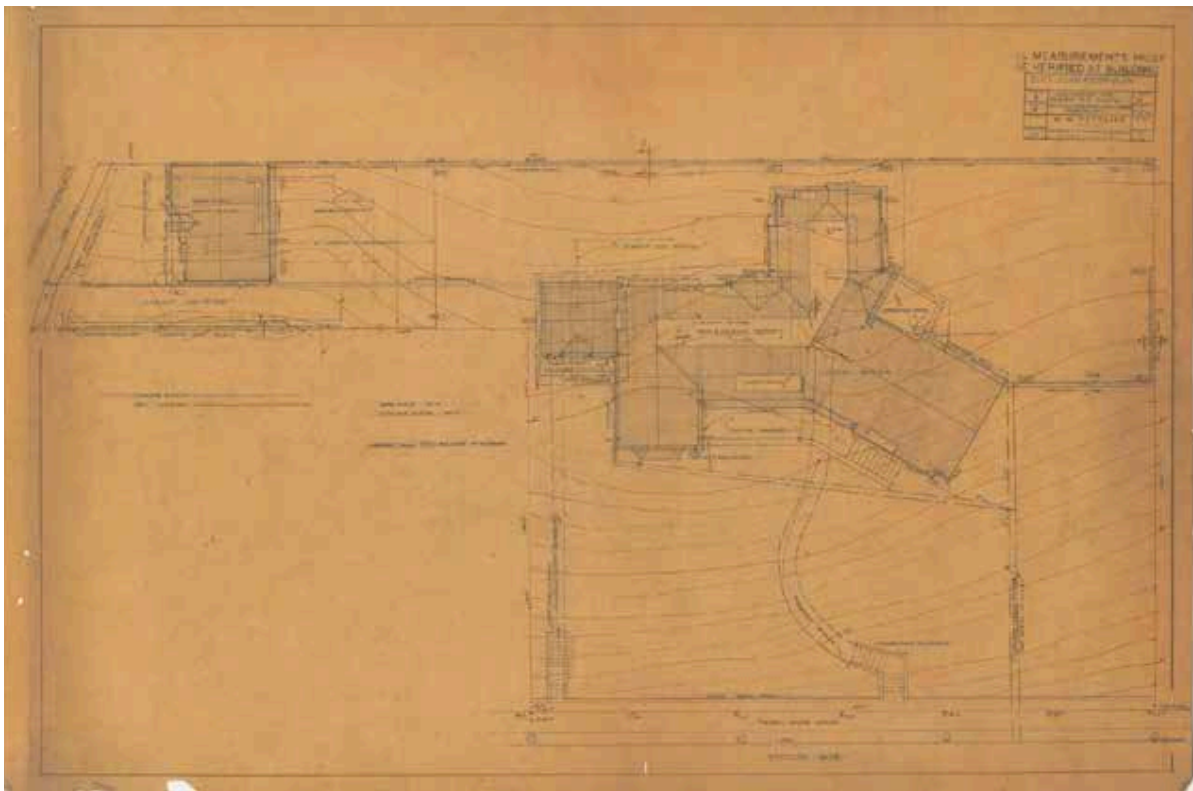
1929 Site and Roof Plan (courtesy The Bancroft Library)
